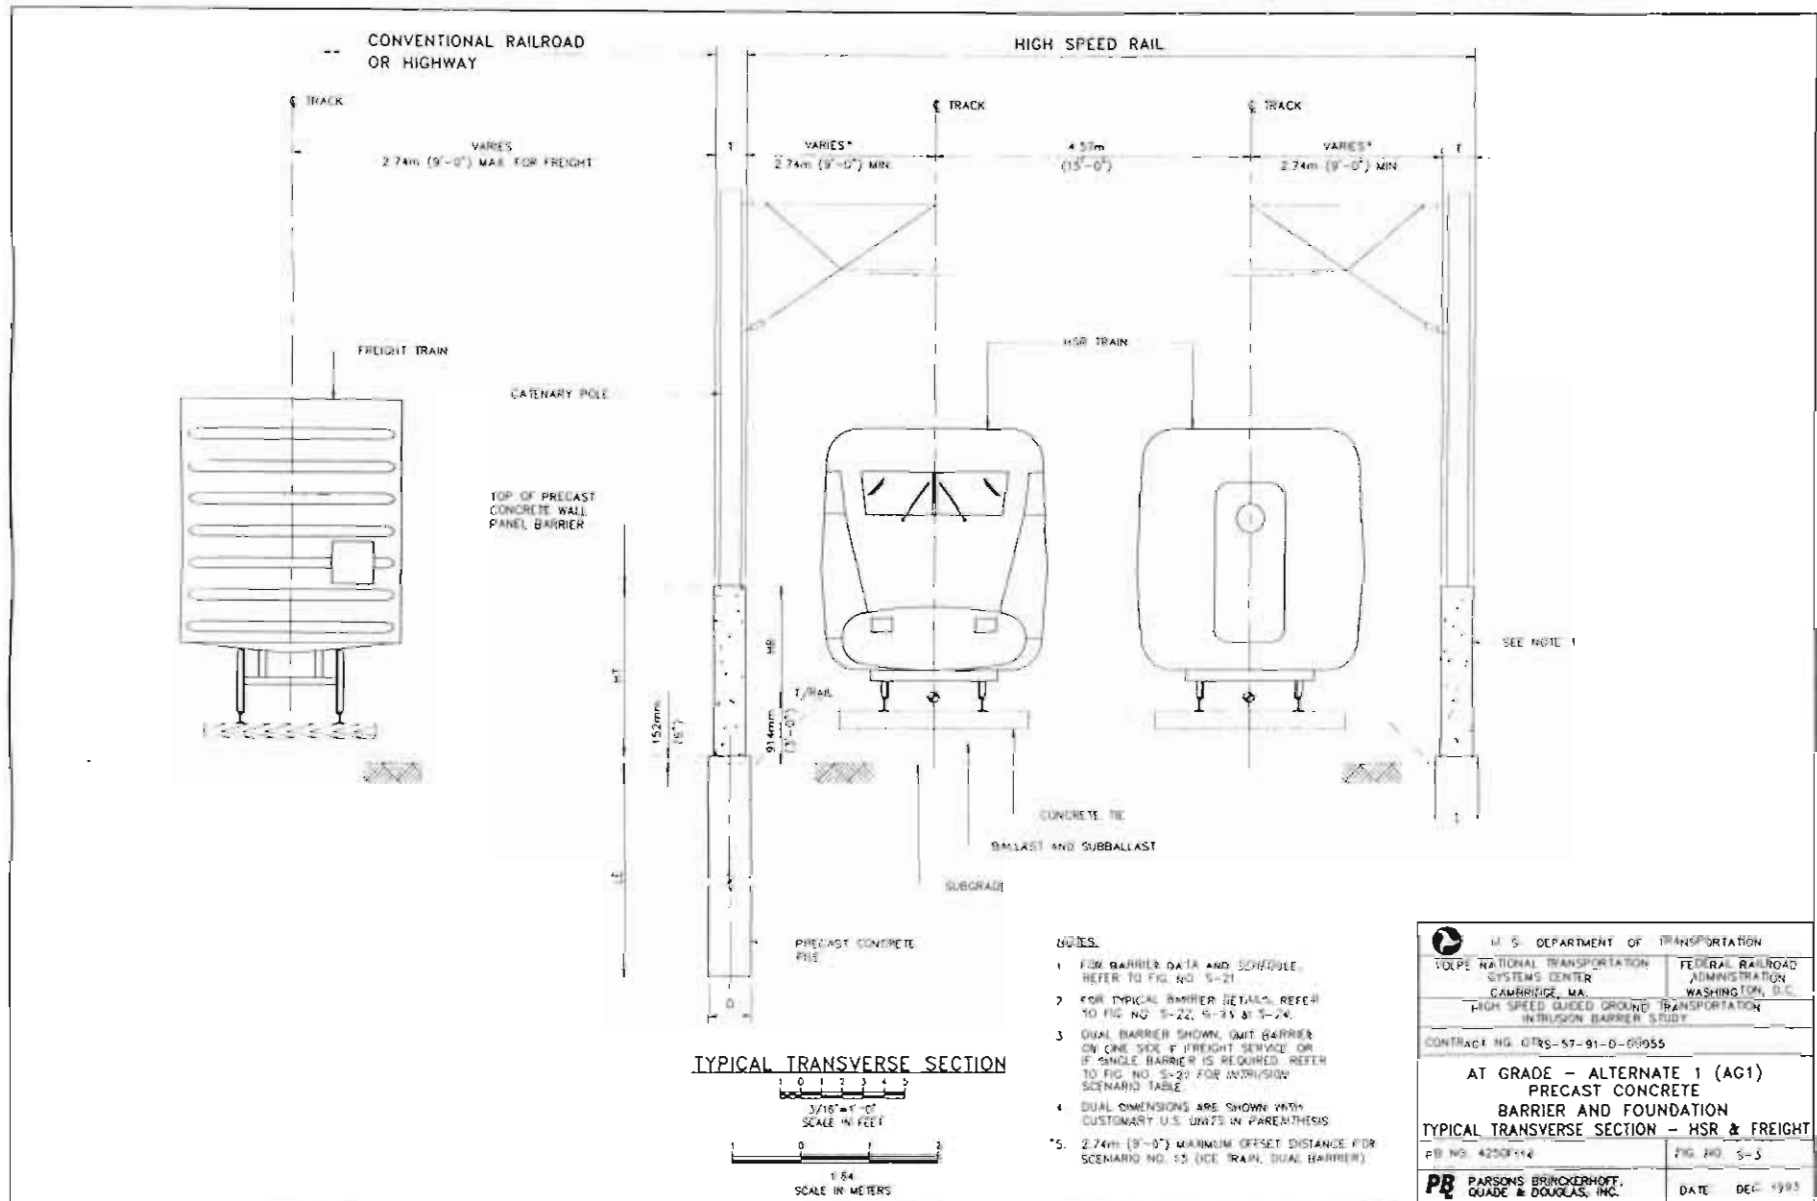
AT GRADE ALTERNATE 1: P/C WALL AND P/C FOUNDATION - TRANSVERSE SECTION/RR
